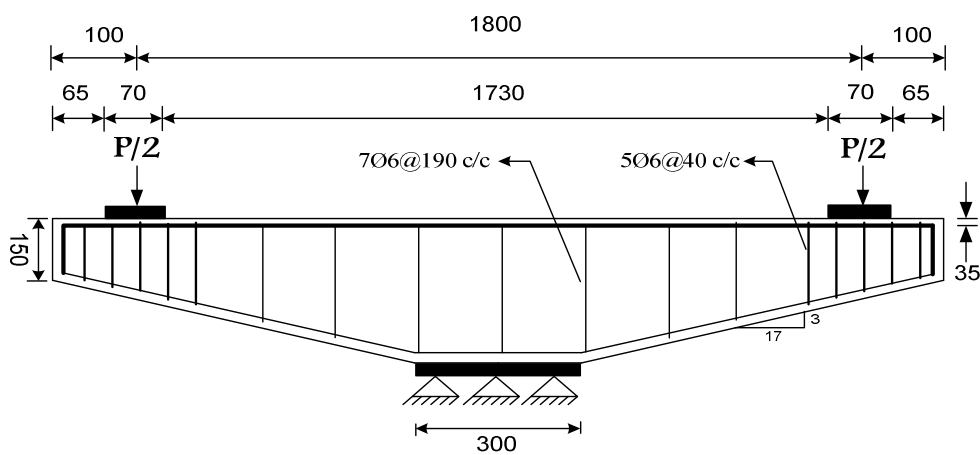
Details of Tapered Beam (TB-0.5S-WC)
